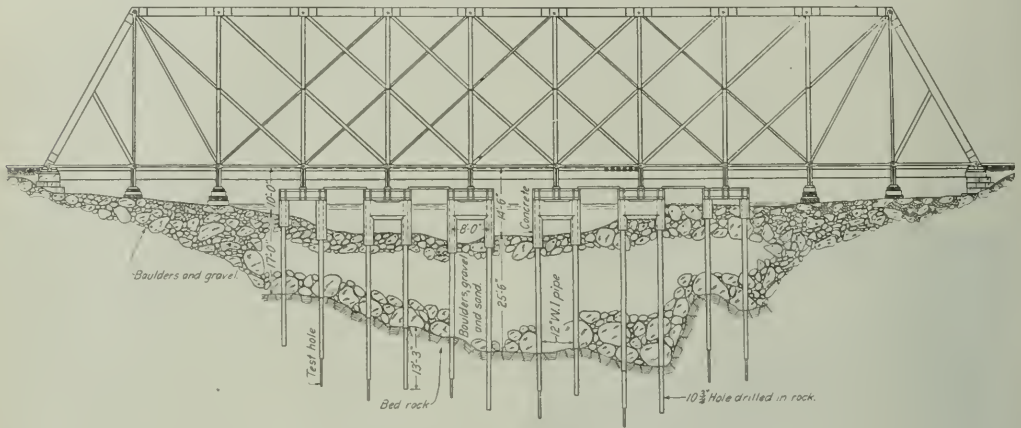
Strengthening a Bridge by Means of Supporting Cylinders
